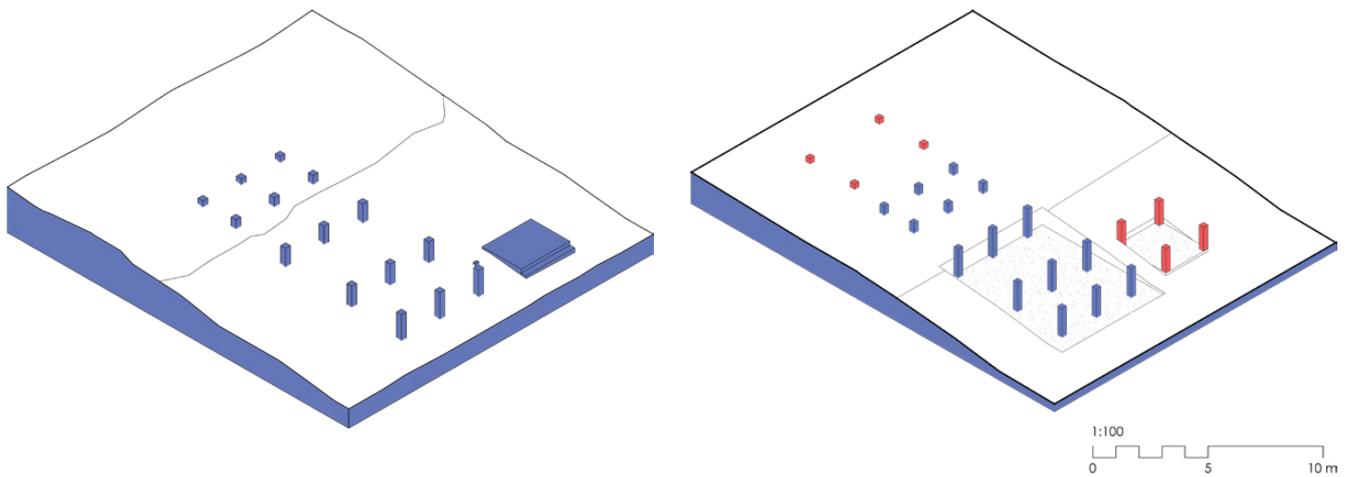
A. Intervention made on the structural plan between the existing and the proposal.
